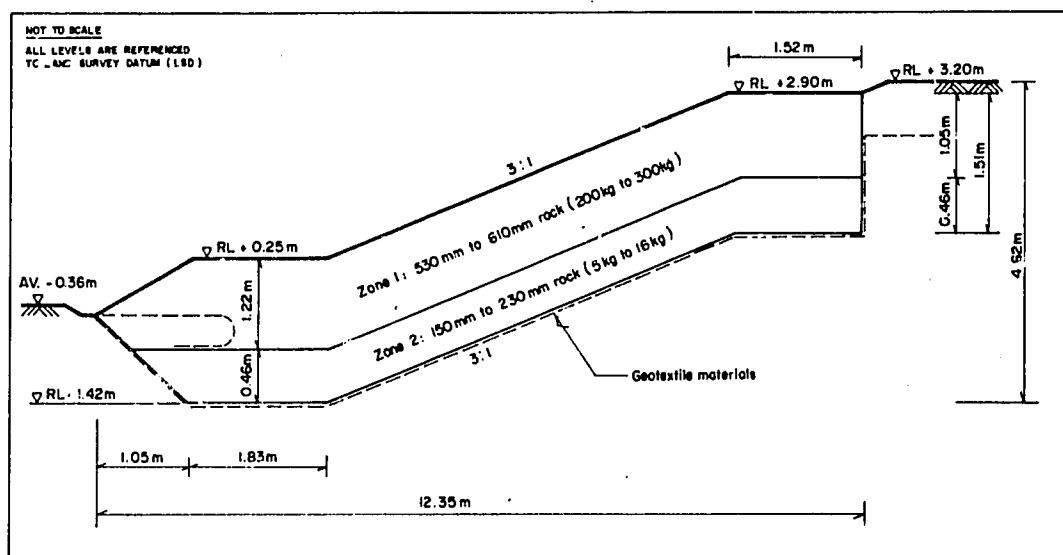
A typical cross-section of the bund protected with rock revetment.
